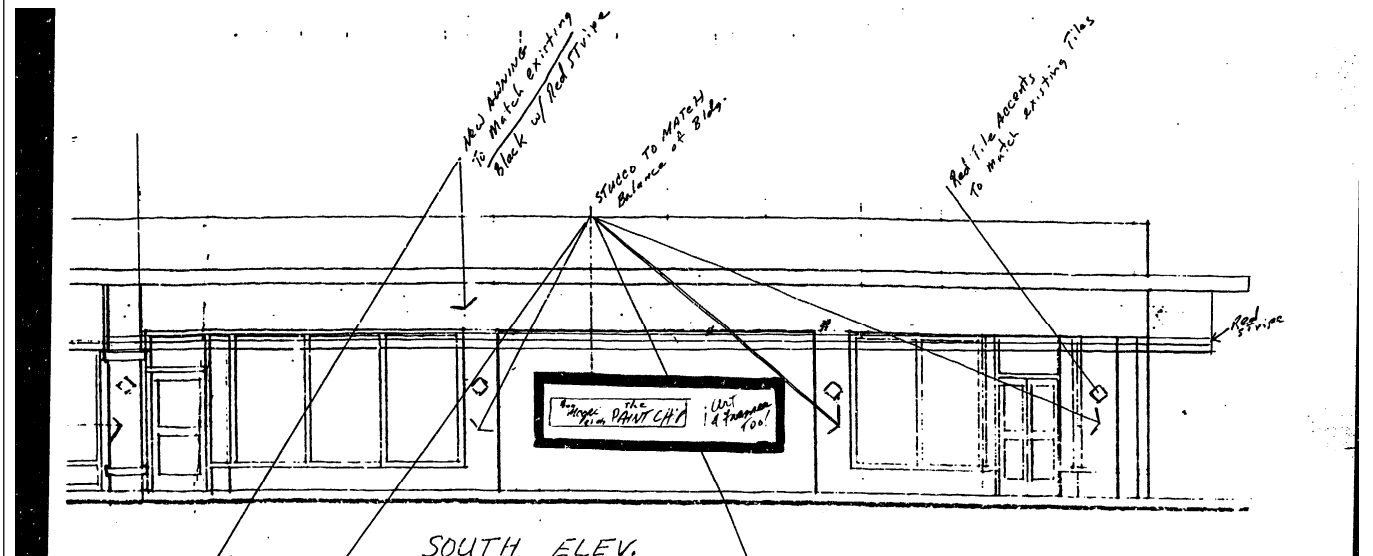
1993 Architectural Plans, exterior renovation to add stucco and awnings to match existing.
